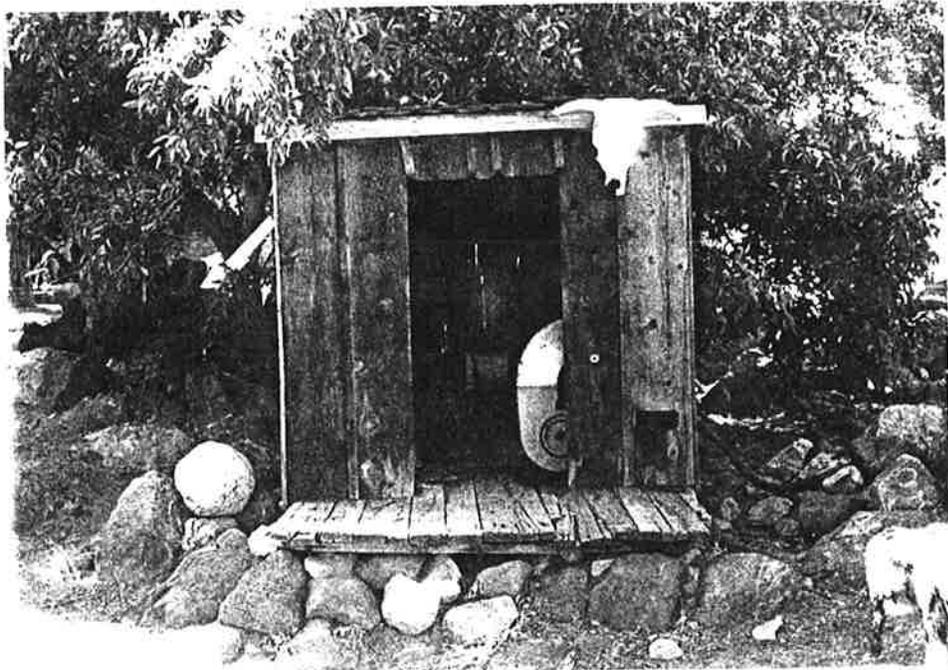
Birch Creek generator shed, east elevation. (Neg. R2-7)
